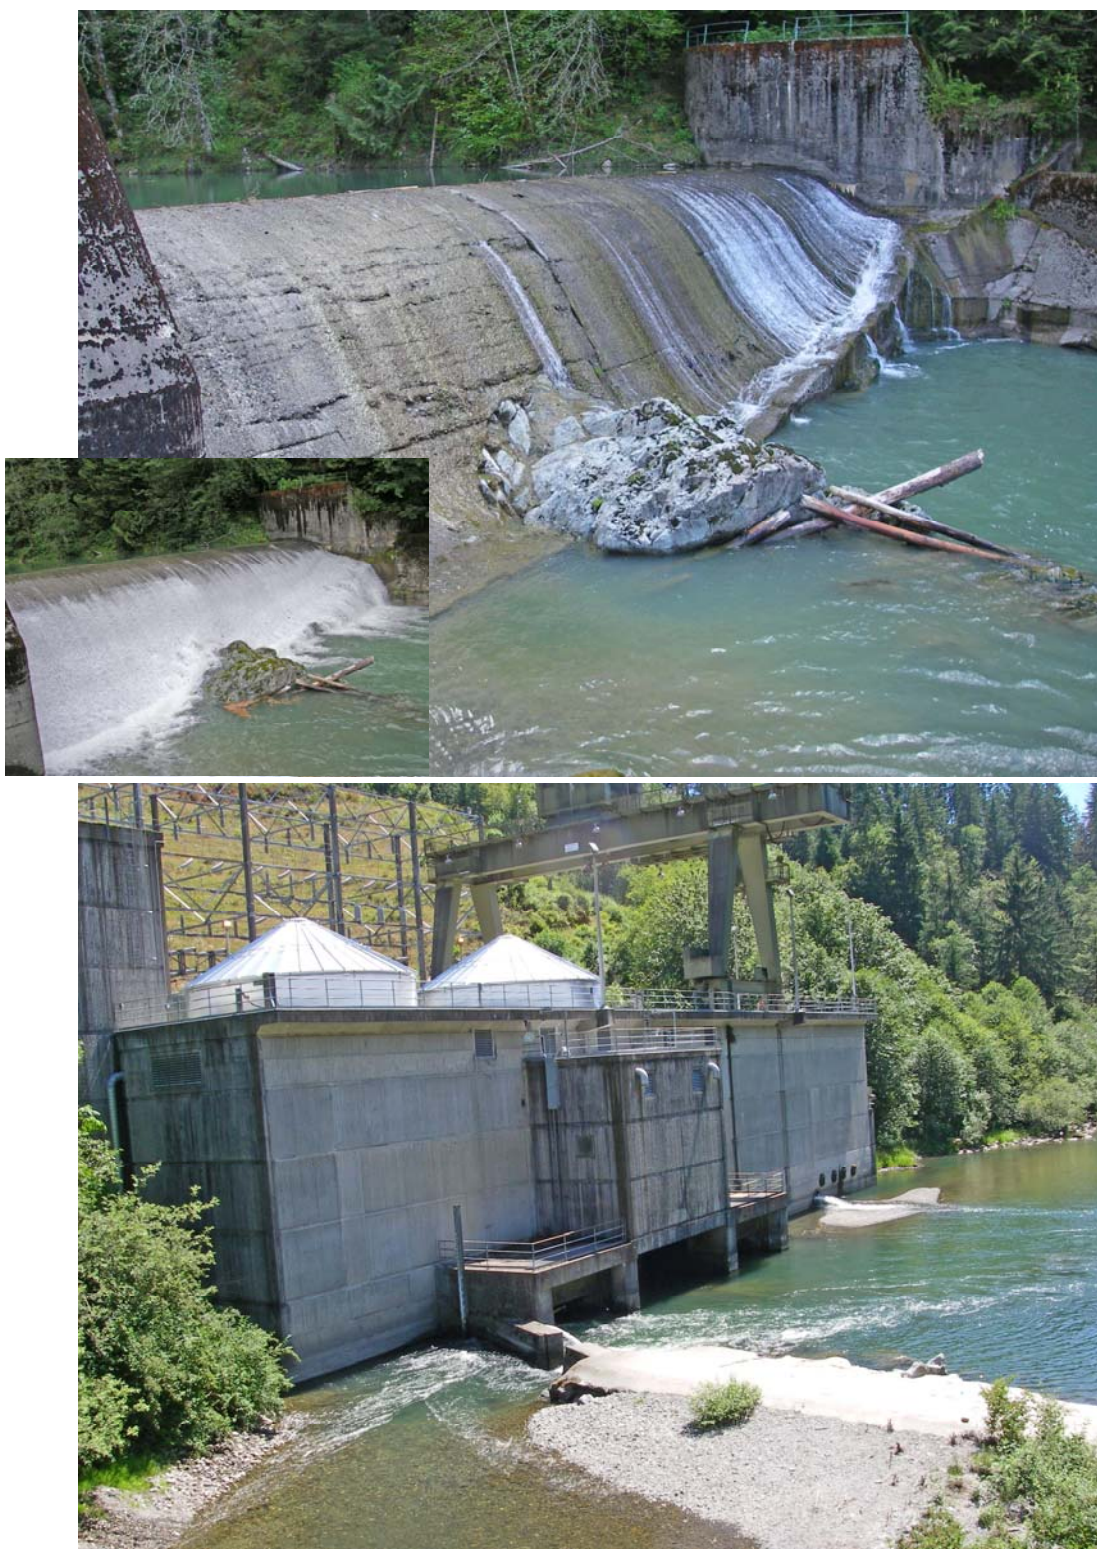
Photographs of Diversion Dam (upper photo and inset photo) and Henry M. Jackson Powerhouse (lower photo) on Sultan River, Washington.
